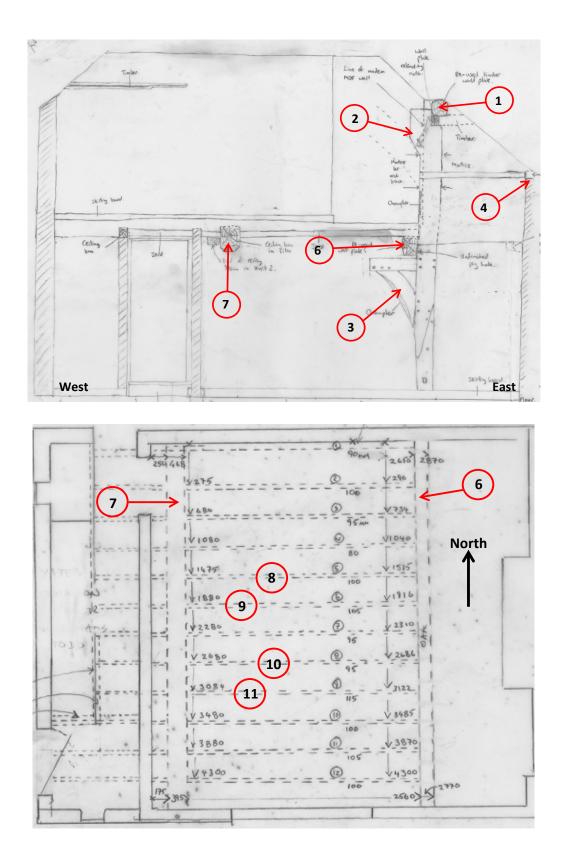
/b: Drawing of south face of north wall of unit C (top), and plan of unit C (bottom), to help locate sampled timbers (after building survey team)
